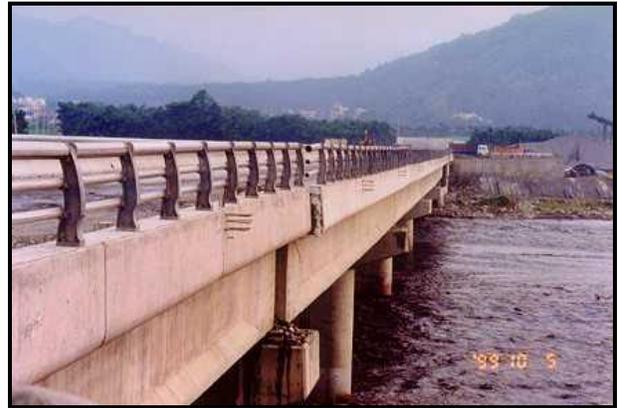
Transversal movement of bridge deck after Taiwan EQ (15)
